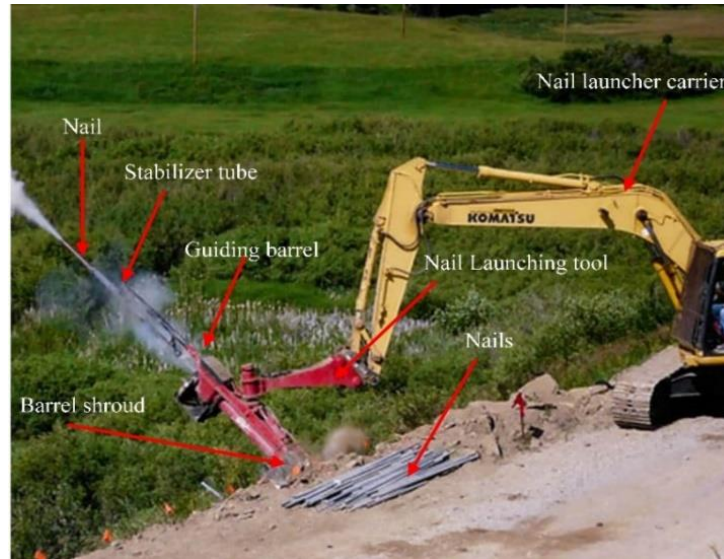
Launched nailing system (Goyal and Shrivastava 2021)
